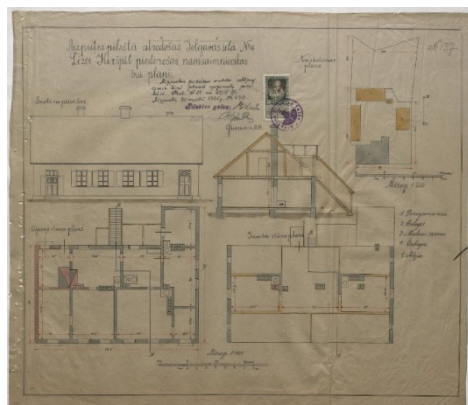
Plan and facade drawing of the household building made in 1926 confirming spatial layout of plans and facades at that time, and depicting the planned changes affecting the use of attic spaces. 1926 Archive material of the Aizpute Local History Museum.
